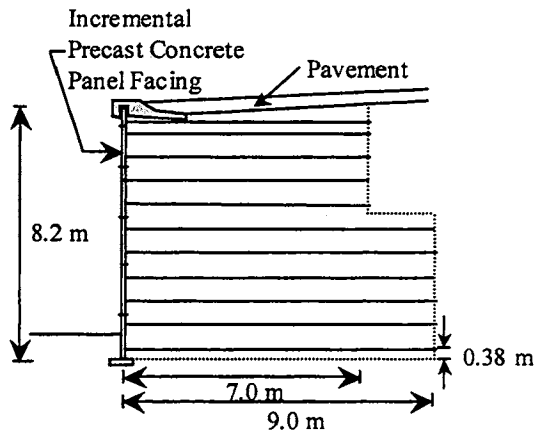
Waltham Cross steel strip MSE wall (adapted from Murray and Farrar, 1990).
